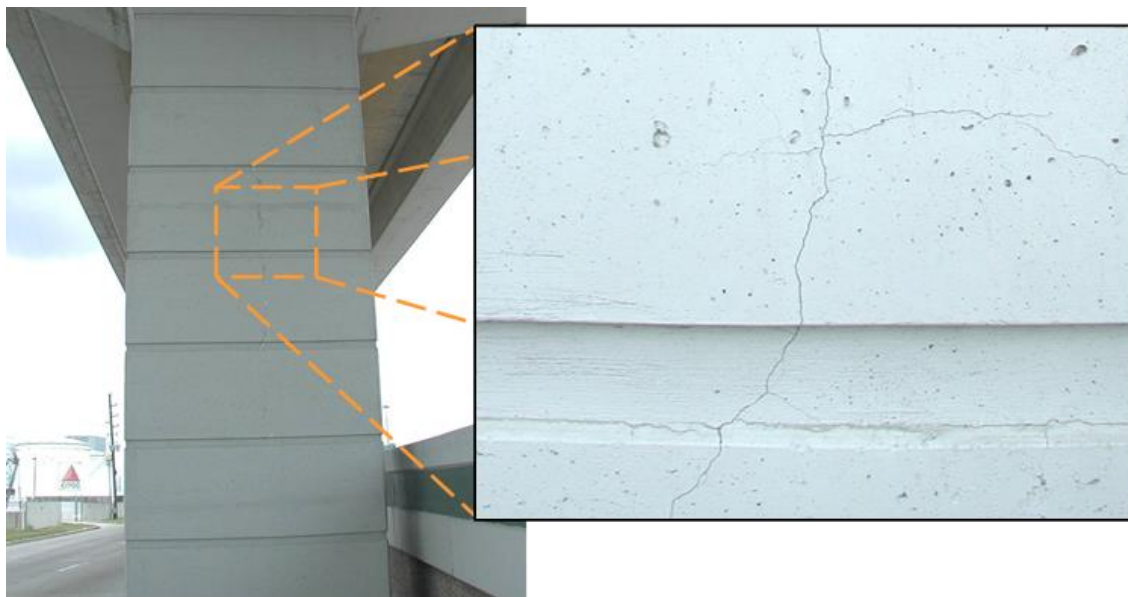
Thermal cracking of a bridge column in Texas (Photo courtesy of Dr. J.C. Liu)
